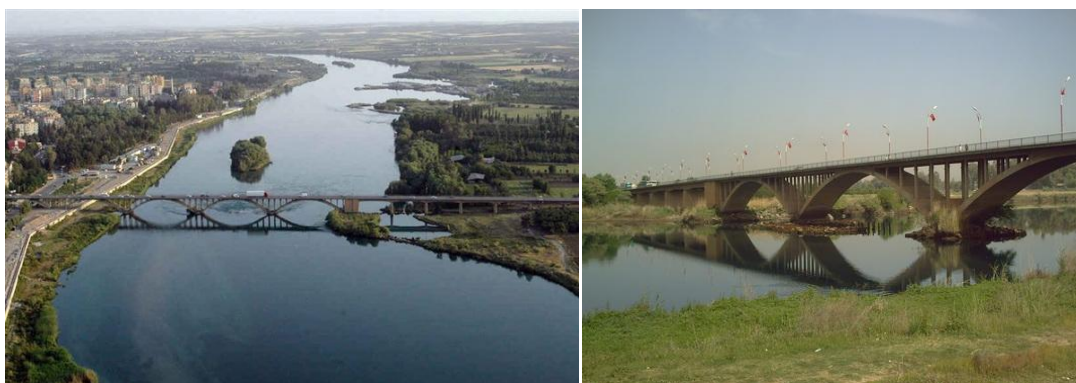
Views of the bridge from the north side toward the south, and from the east side toward the west side (General Directorate of Highways Archive)
